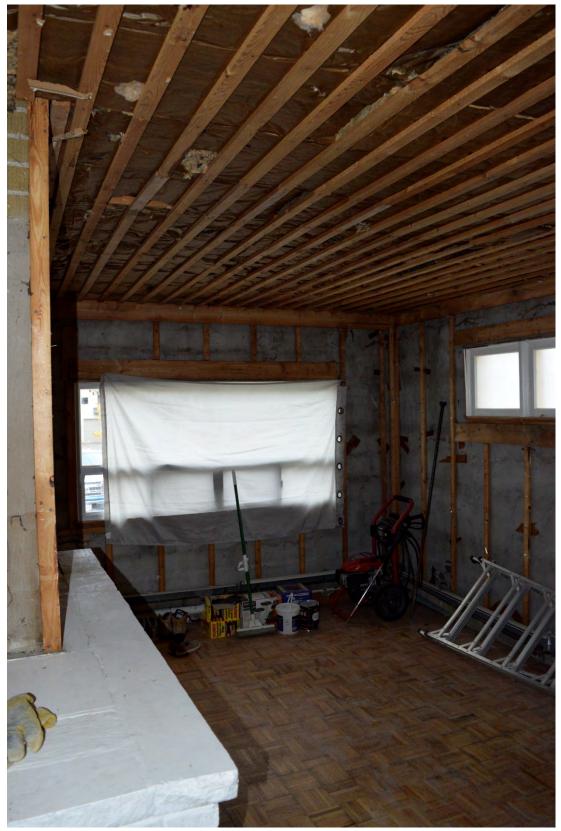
Interior of addition, interior of brick walls have been parged, facing west
